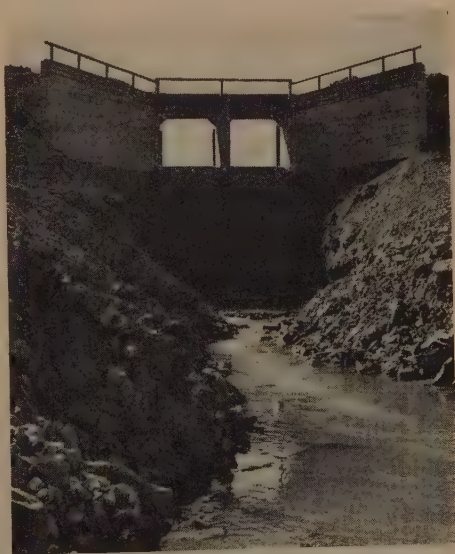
REINFORCED CONCRETE COMBINATION OVERFLOW STRUCTURE, BRIDGE AND RECOVERY-WATER INTAKE.
